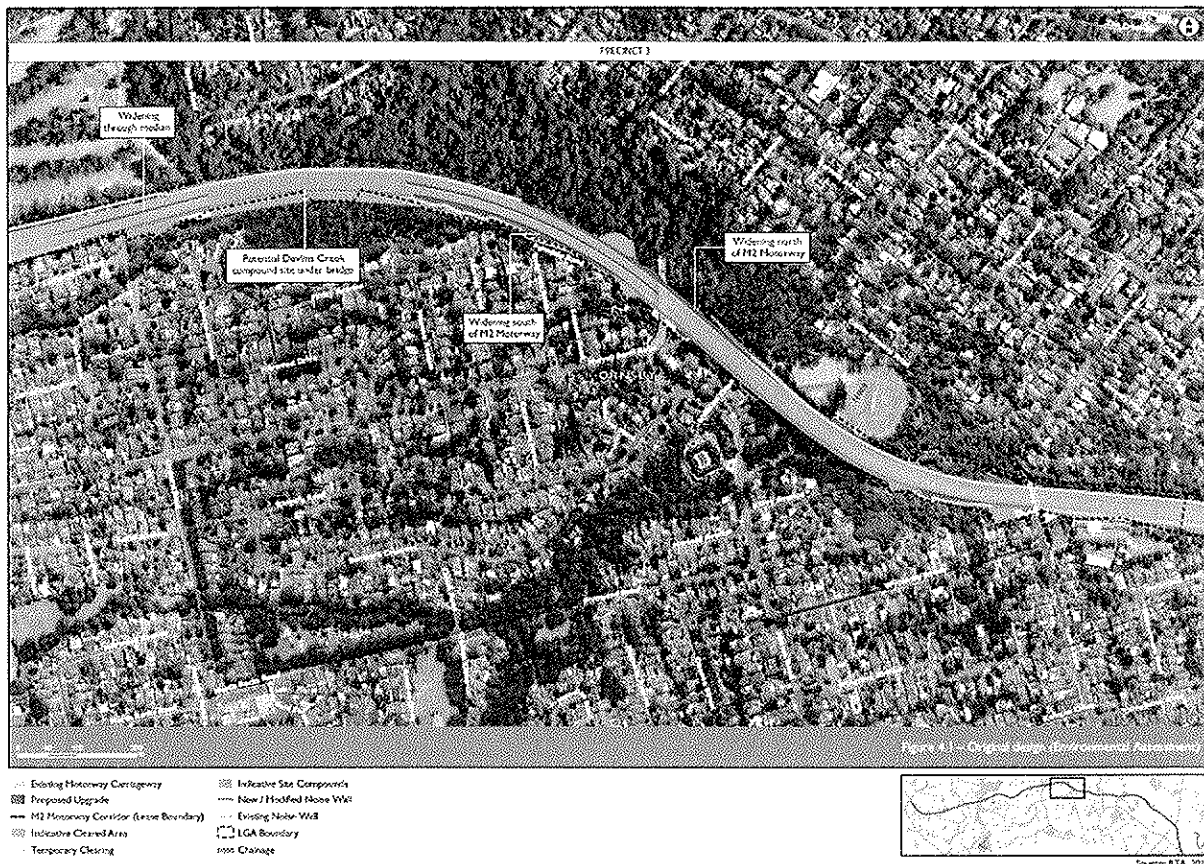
Original Design of Kirkham Street/Murray Farm Road Overbridge Area (Source: M2 Upgrade Submissions and Preferred Project Report, NSW Roads and Traffic Authority August 2010)
